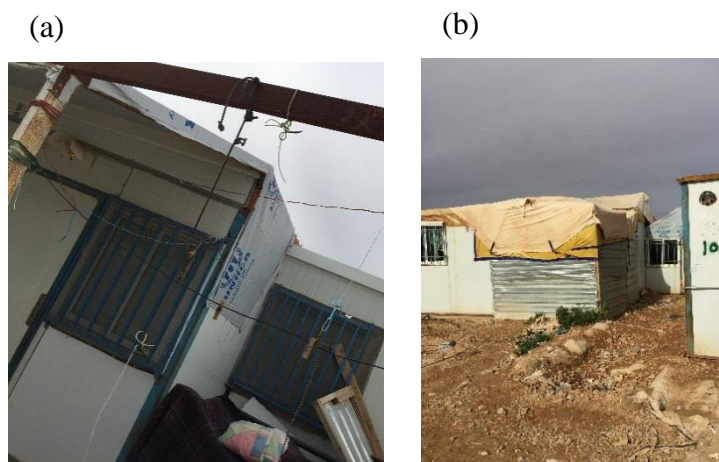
Shelters inside the Zaatari camp: a) A shelter with canvas covering the roof, b) A shelter with an extension made out of corrugated sheets walls and canvas roof.
